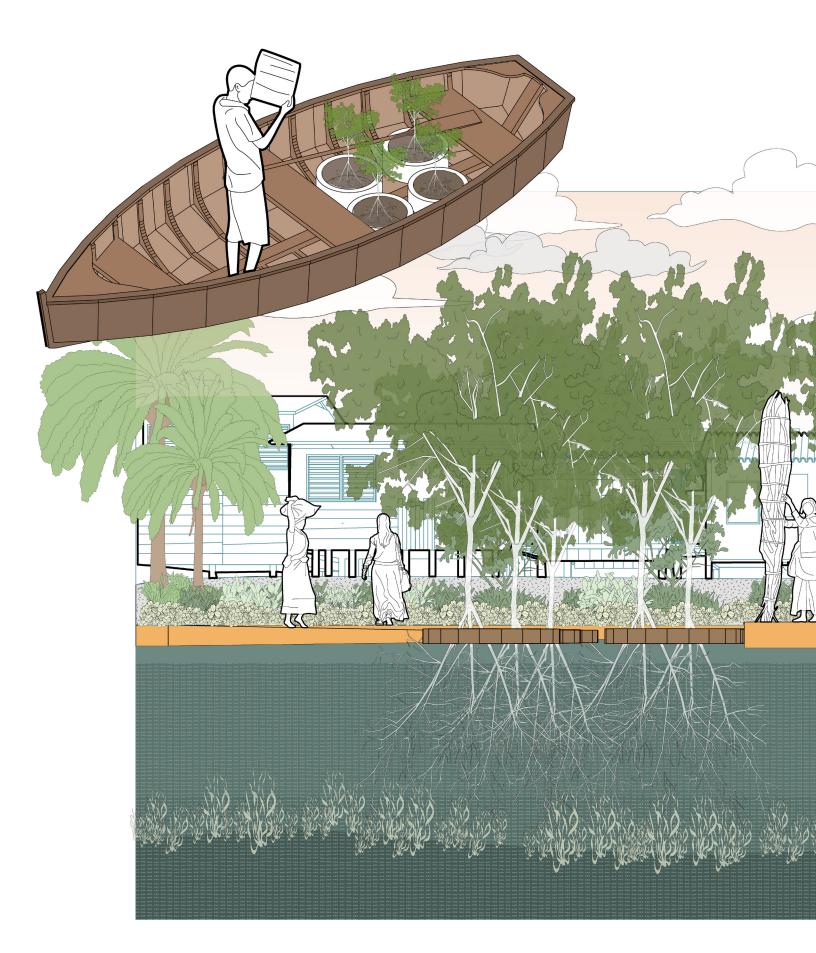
Section showing mangrove planting at the scale of the site Drawing by author
